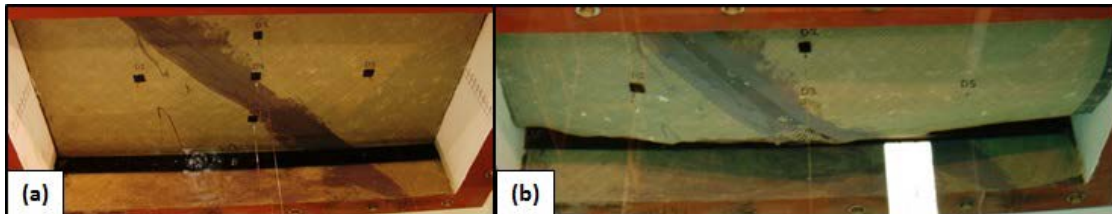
SW15. (a) Pretest view. (b) As the retrofitted wall deformed under load, the film began to pull away from the right edge of the wall.
